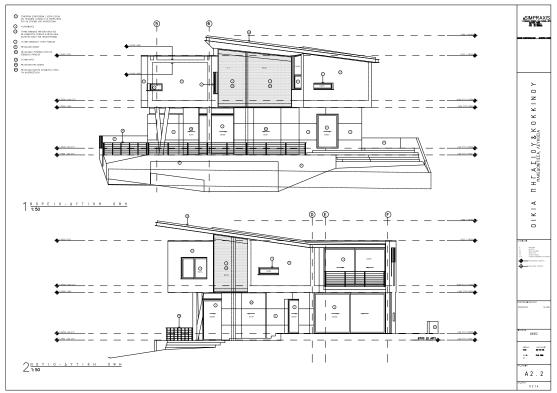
Residence Project Elevation by Simpraxis Architects (Bozatlı)
